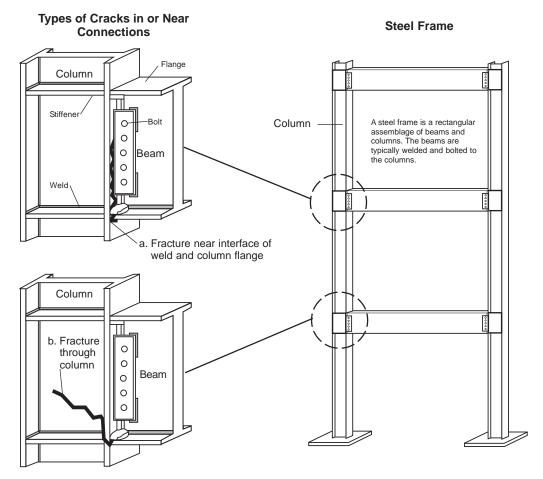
Steel Frame. Two types of cracks found in steel frame buildings after earthquakes.
